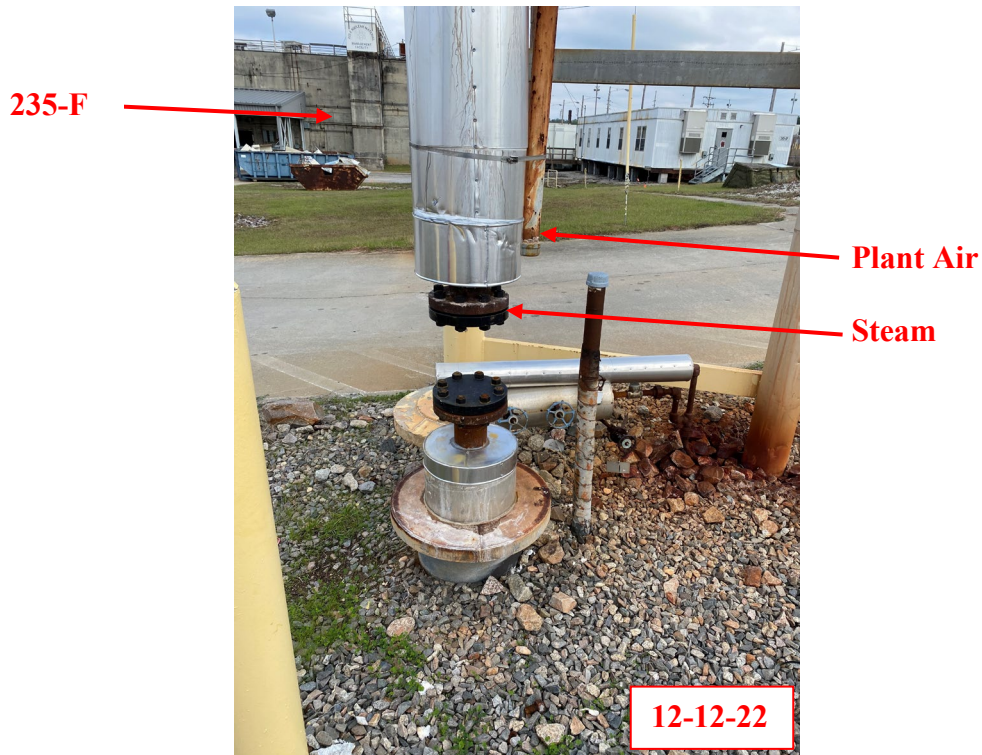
Air-Gapped Steam and Plant Air to 235-F, West of Building at Base of Pipe Bridge
